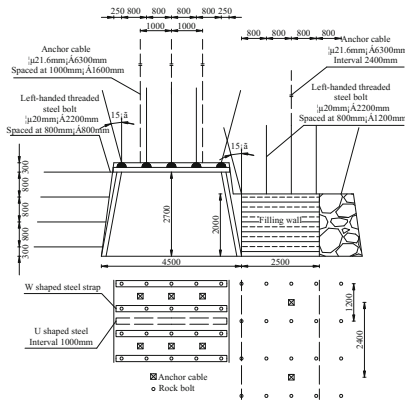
The track entry of 1024 working face in Zhongxin coal mine
